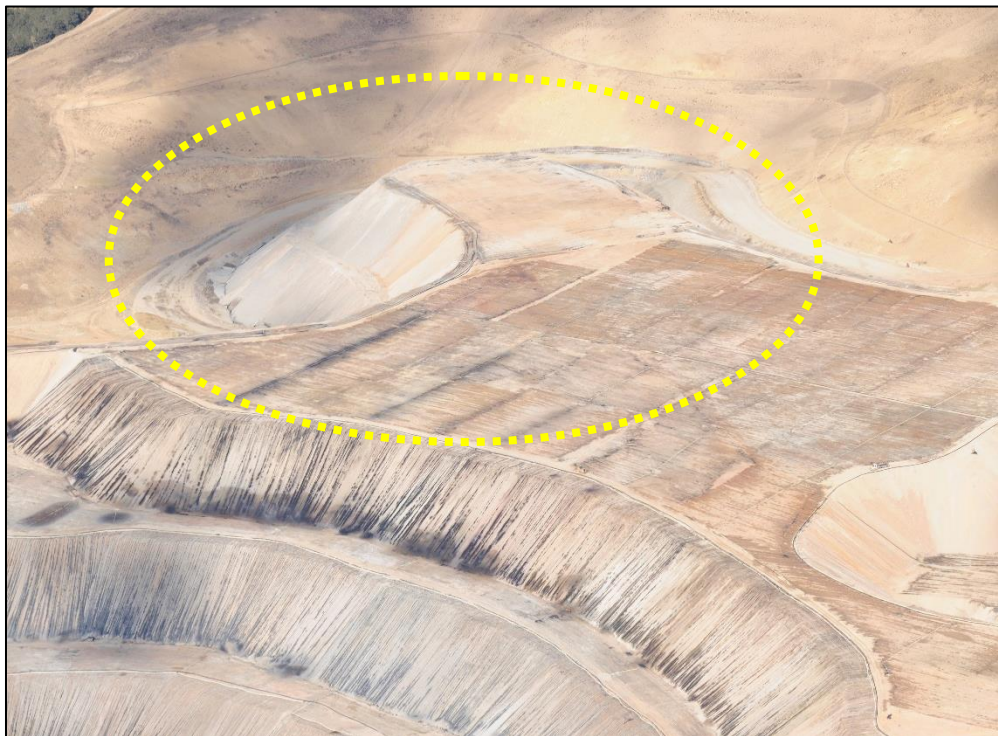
View looking across northwestern portion of SGVLF where operation has completed two 100-foot lifts (at 9,750 feet and 9,850 feet) above the haul road. The Division inquired how the ore-stacking plan approved in TR-103 will be adhered to in this particular area (circled).
